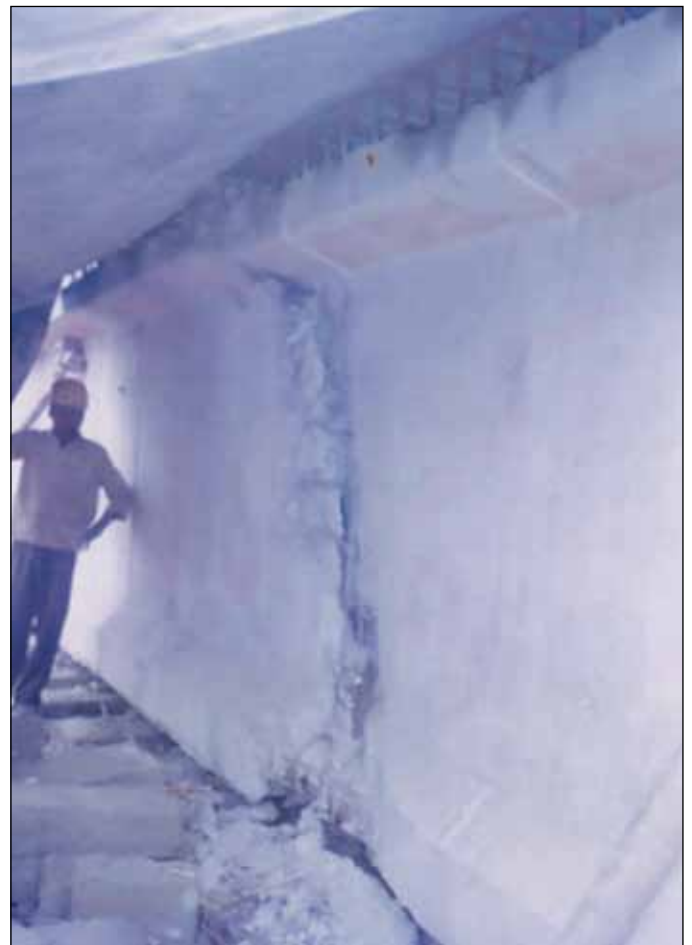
Failure of prestressed concrete girder during stressing
